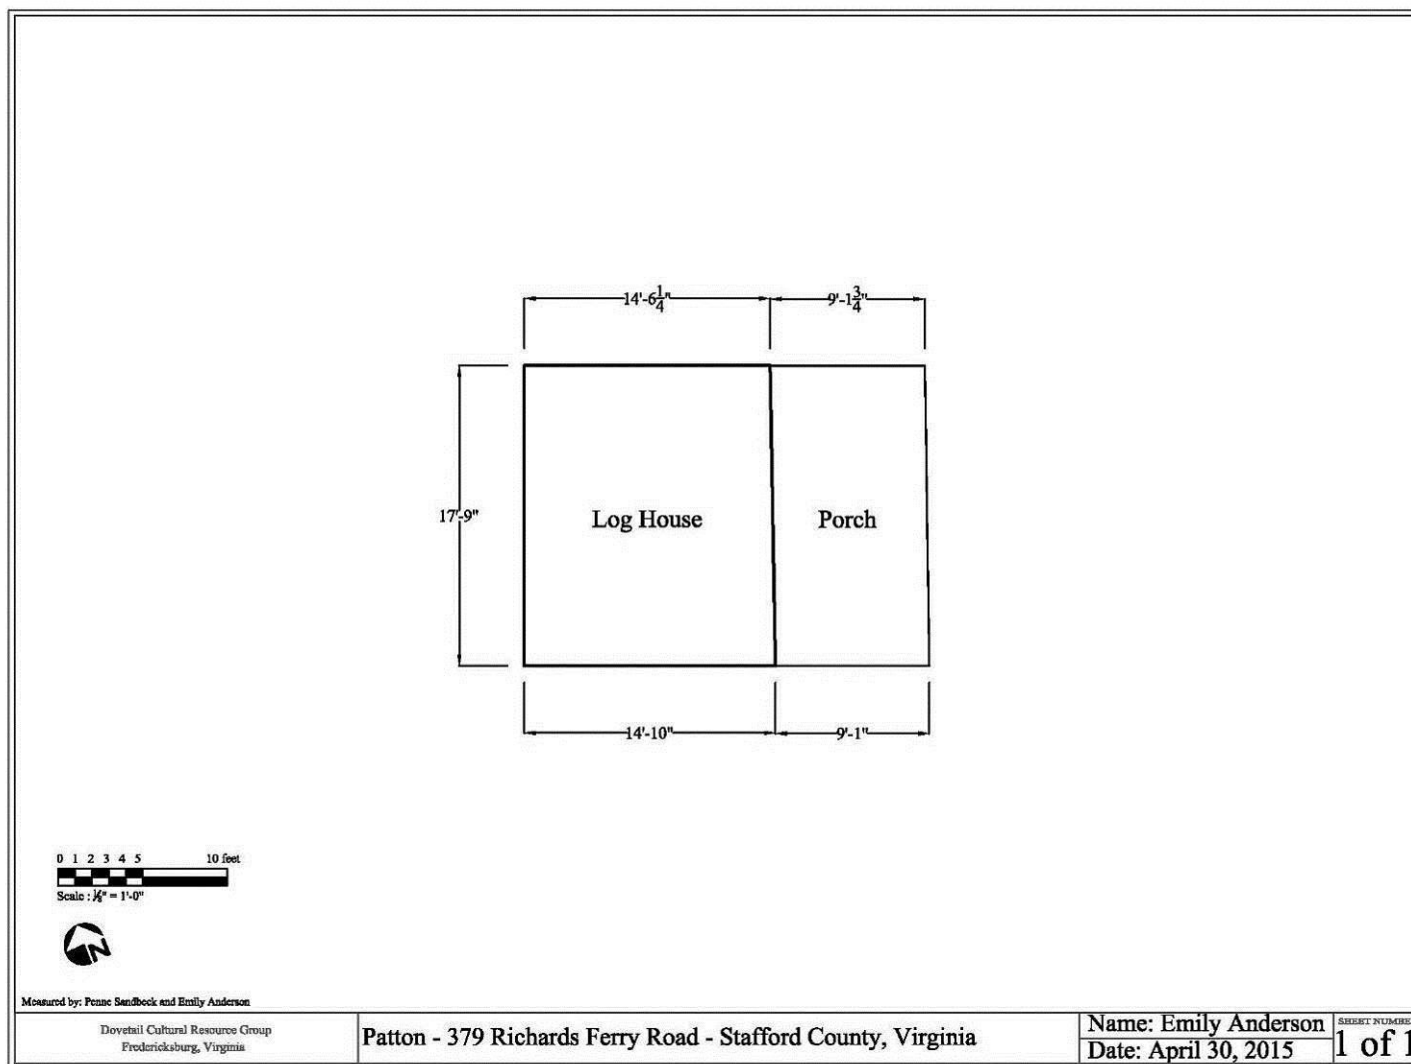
Measured Exterior Plan of the Outbuilding on the Patton Property.
